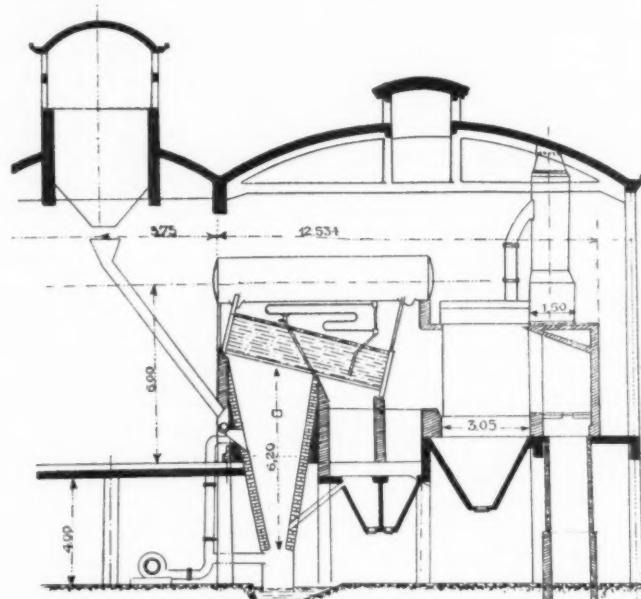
STOUFF FURNACE AS INSTALLED WITH A BABCOCK BOILER
